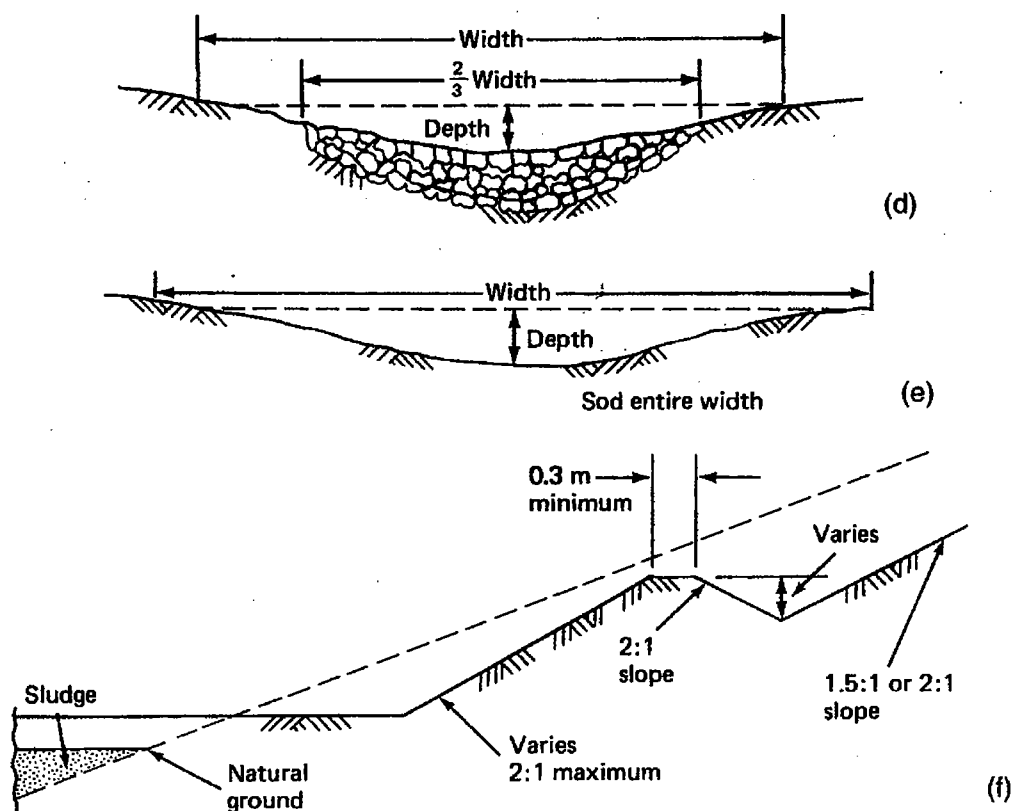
cont'd (d) stone-lined channel, (e) sodded earthen channel, and (f) earthen drainage channel on sloping embankment.
